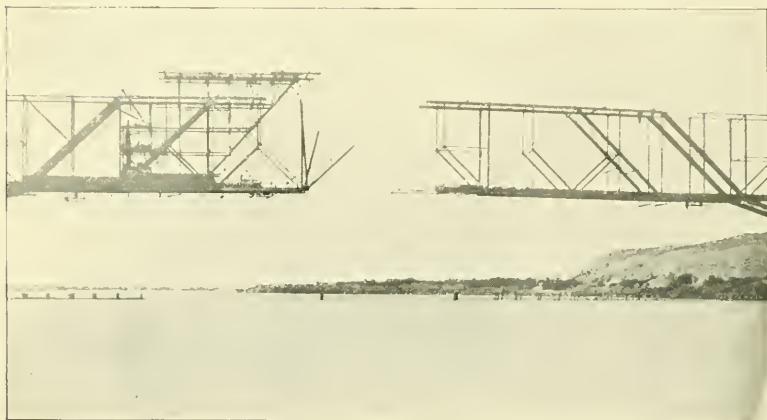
RED ROCK CANTILEVER OVER COLORADO RIVER. PHOENIX BRIDGE COMPANY.
